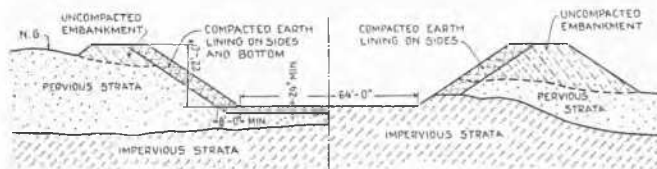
Typical Cross Section of Heavy Compacted Earth Lining
